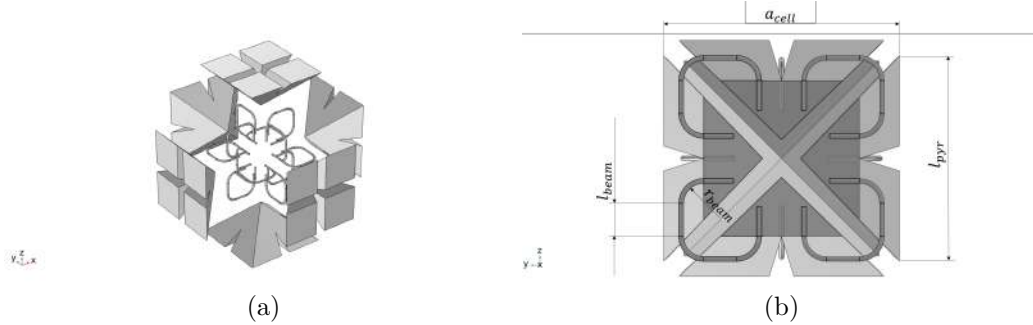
Structures of the UC: (a) Exploded 3D view (b) Section view with details of the connections between steel beams and concrete pyramids.
